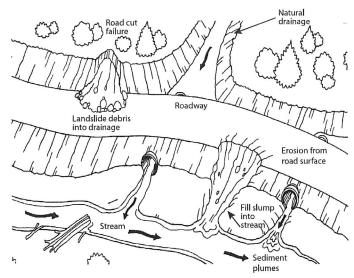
Road system problems to look for during a road inspection. *Source:* Keller and Sherar 2003.
